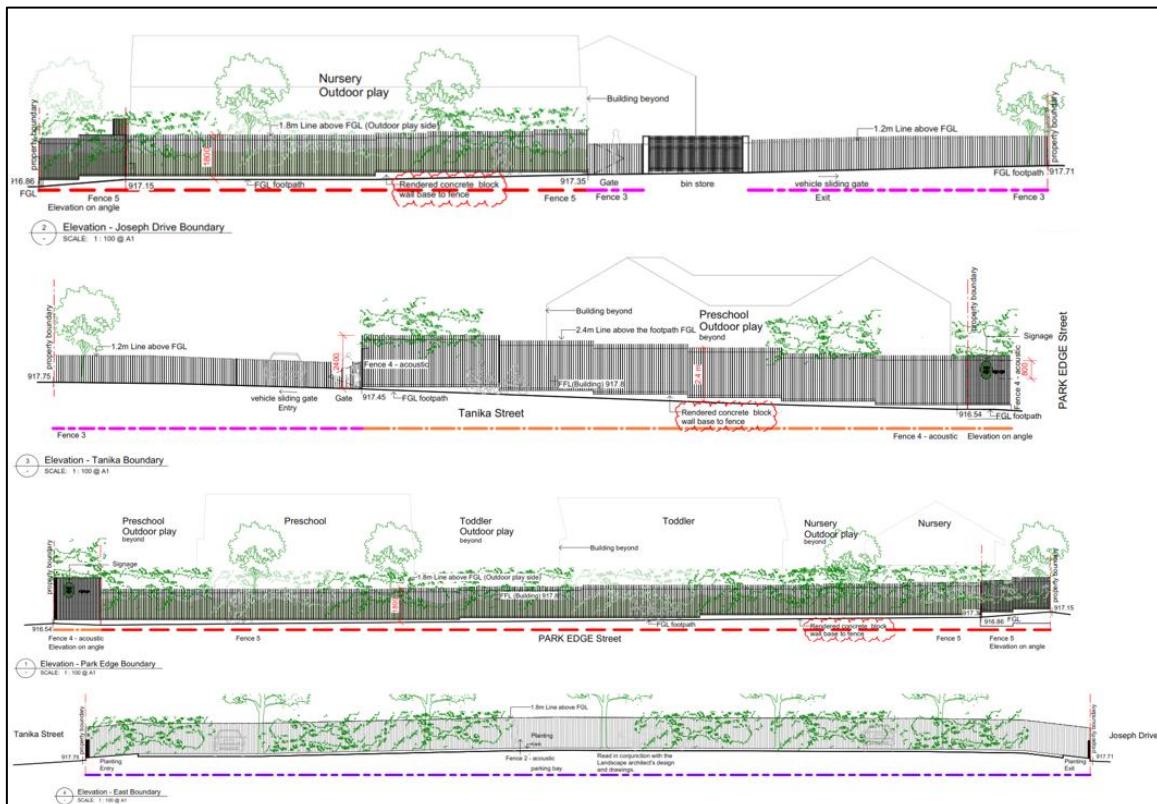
proposed fencing on Joesph Drive, Park Edge Street, Tanika Street and East boundary
